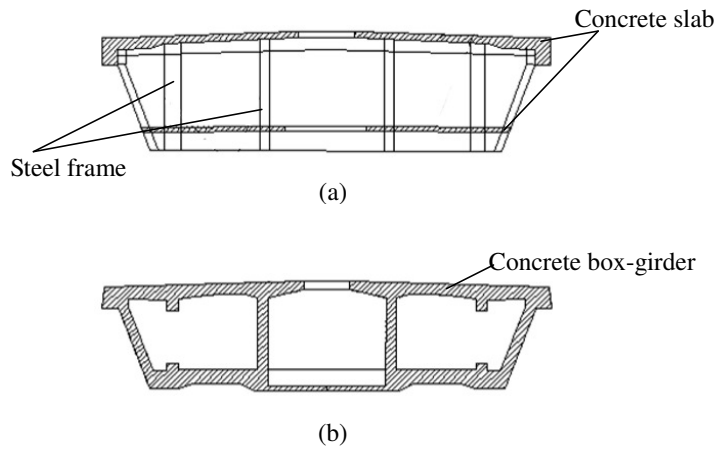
Cross-section of the bridge deck [3.23] (a) main span; (b) side spans
